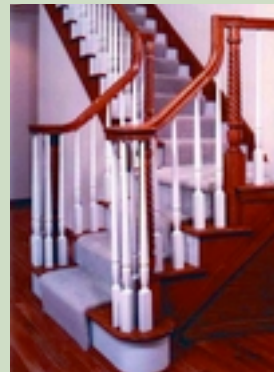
Grab Bars, Window Guards, Stair Railings, and Stair Gates.
